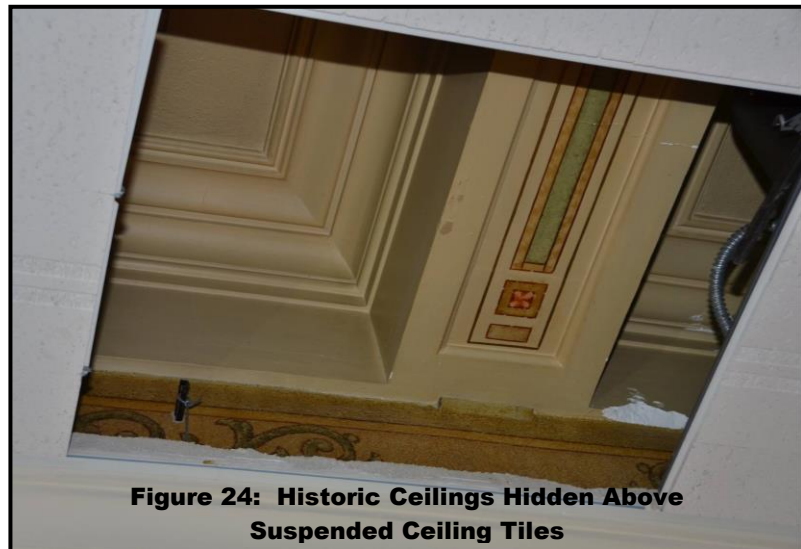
Historic Ceilings Hidden Above Suspended Ceiling Tiles
